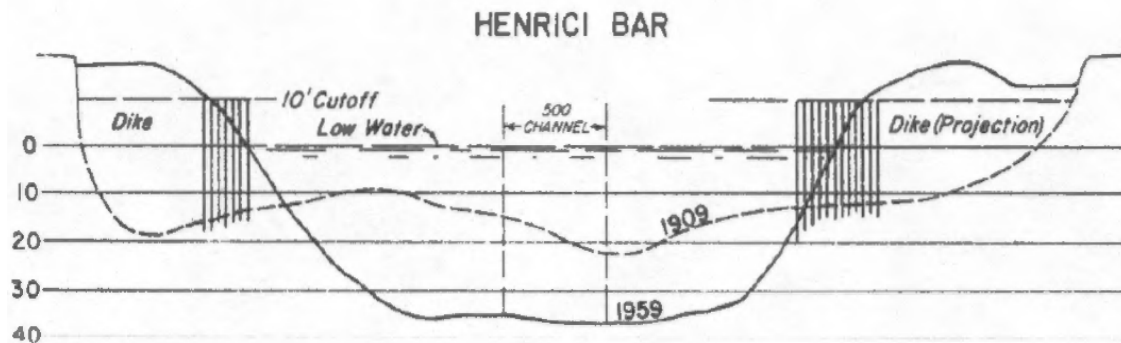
Cross section of Henrici Bar before and after pile dike construction.
